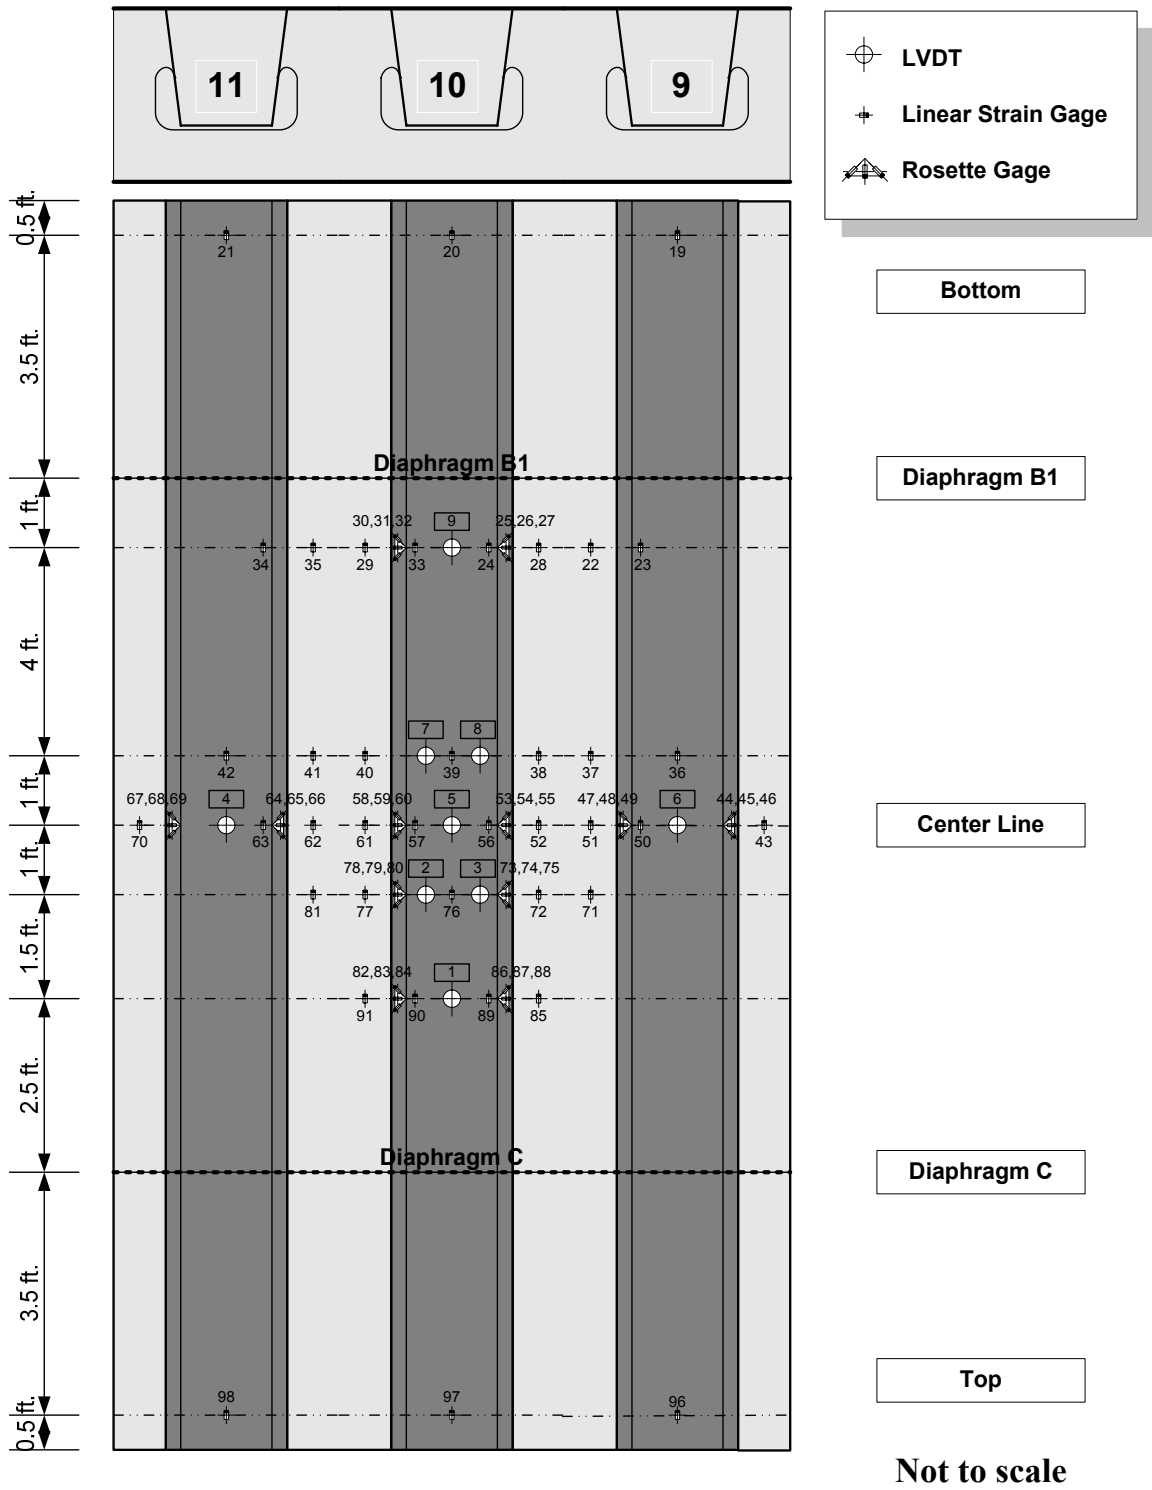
Instrumentation Plan for Triple Rib Beam-column, TBC
